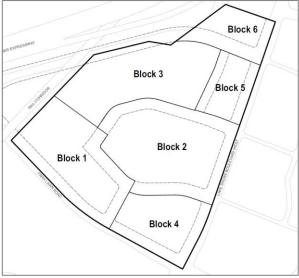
Block Plan (Source: Draft Zoning By-law, 2020)
